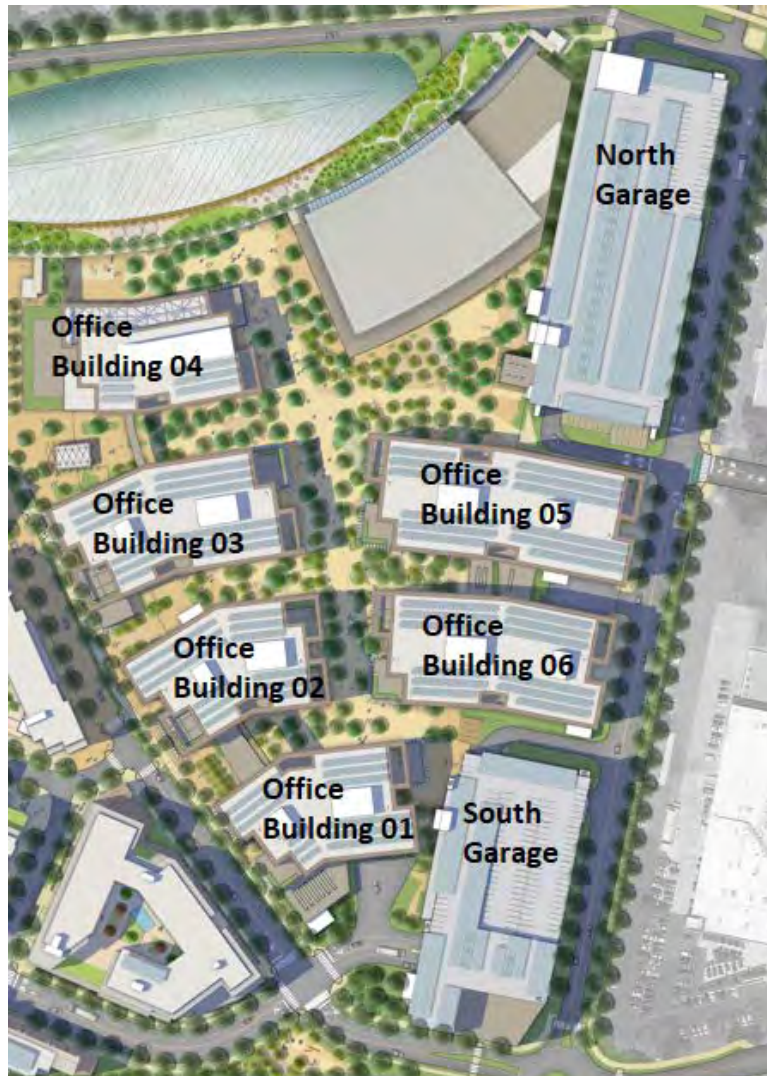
Conceptual site plan showing the locations of proposed office buildings and garages, as well as the proposed extent of landscape vegetation and trees.
